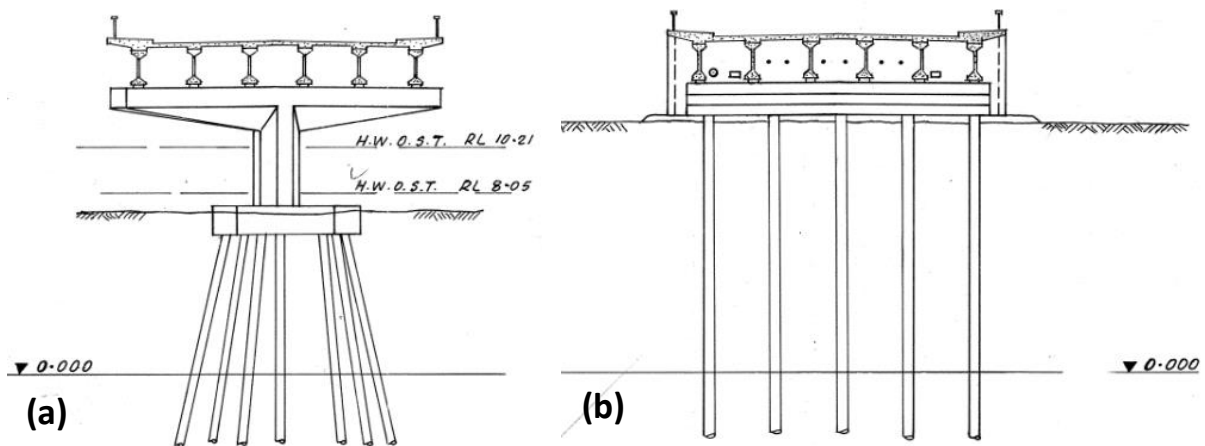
South Brighton Bridge sections, (a) pier and pier piles, (b) abutment piles
